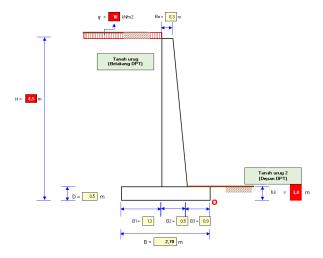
Details of the Retaining Wall Calculation Drawing Source : PT. Benantin Surya Cipta
